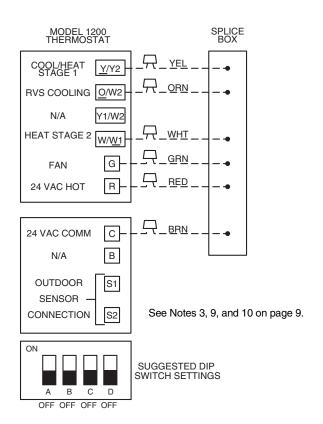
Single-Speed Packaged Heat Pump with Single-Stage Gas Furnace — Model 1200 Thermostat
